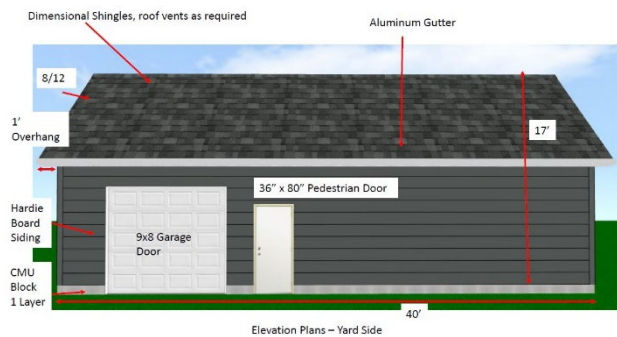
, by Applicant: showing yard (east) side elevation of the proposed garage.
